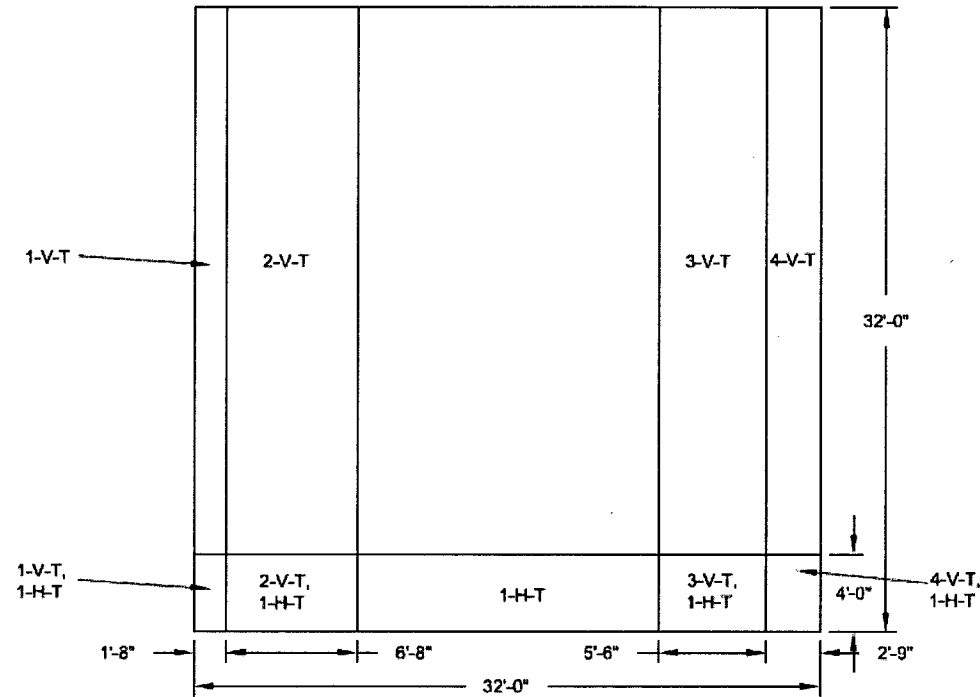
H.6-189 Wall 12 Looking From Outside Transverse Reinforcement Zones
